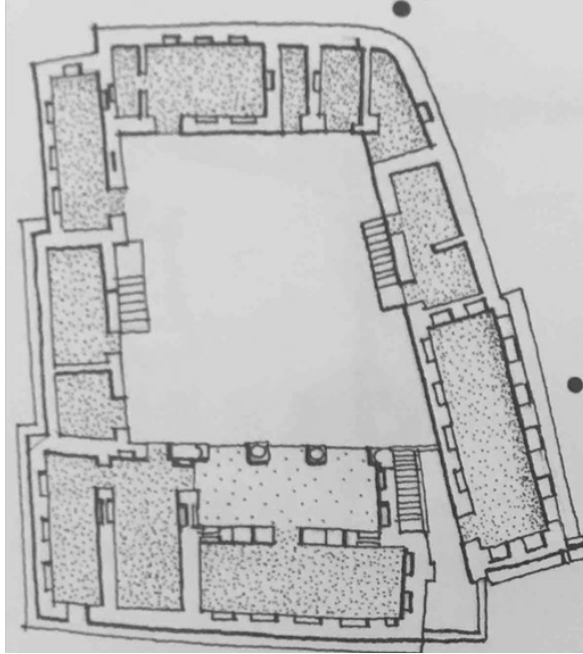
Mohammed Said Naserallah House floor plan (Doha) (1920) (Jaidah and Bourennane, 2010).
